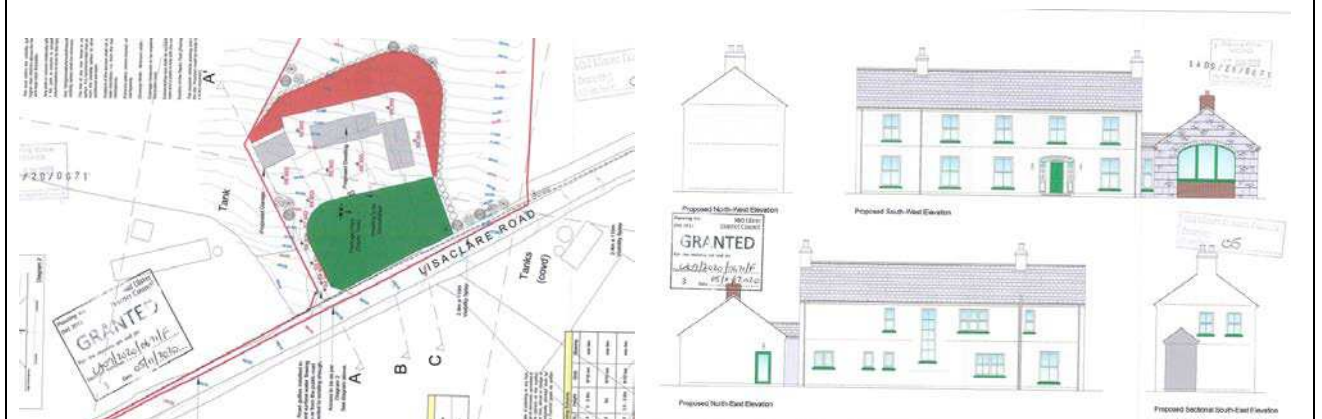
, 5 & 6 dwelling and garage to south LA09/2020/0671/F
